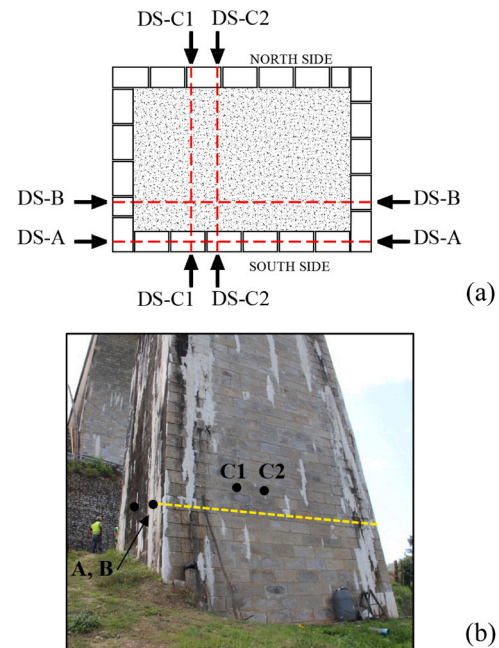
(a) Pier cross section and (b) external view to the pier with direct sonic test locations.
